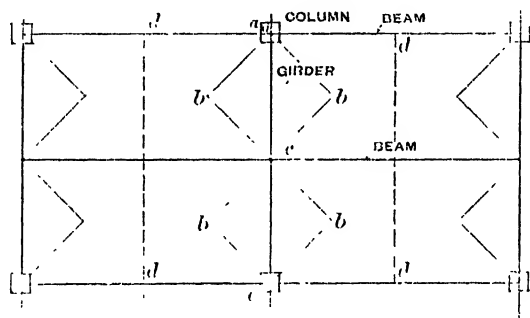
Distribution of Beam and Slab Loads to Girder. (See p. 432.)
